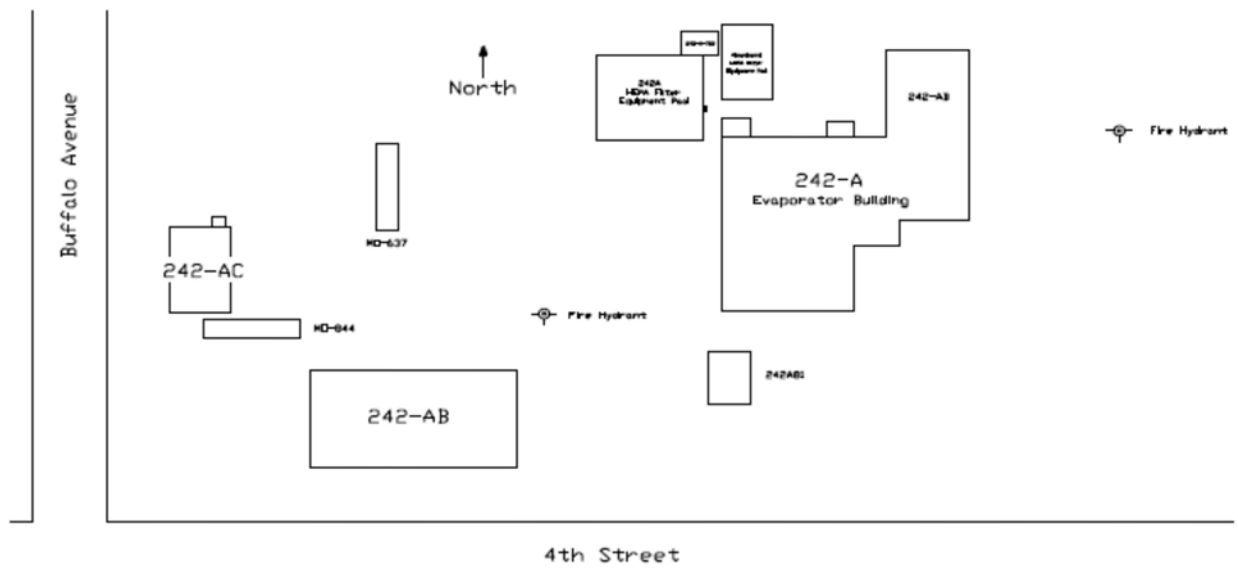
Site Plan for the 242-A Facility (from HNF-SD-WM-FHA-024, Revision 8B)
